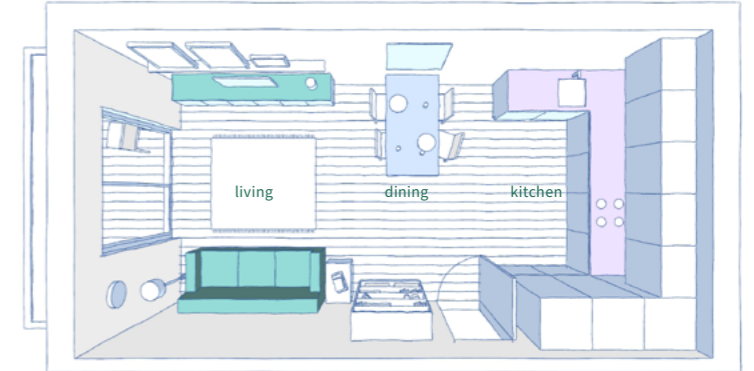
Example of open plan living for 2 person flat. If planning for an open plan living/kitchen/dining space, drawings must illustrate a clear distinct zone for the kitchen, dining and living areas and circulation must not be compromised. It is recommended that the principal width of the living space is at least 3.2m. An unobstructed view and access to the homes private amenity will
